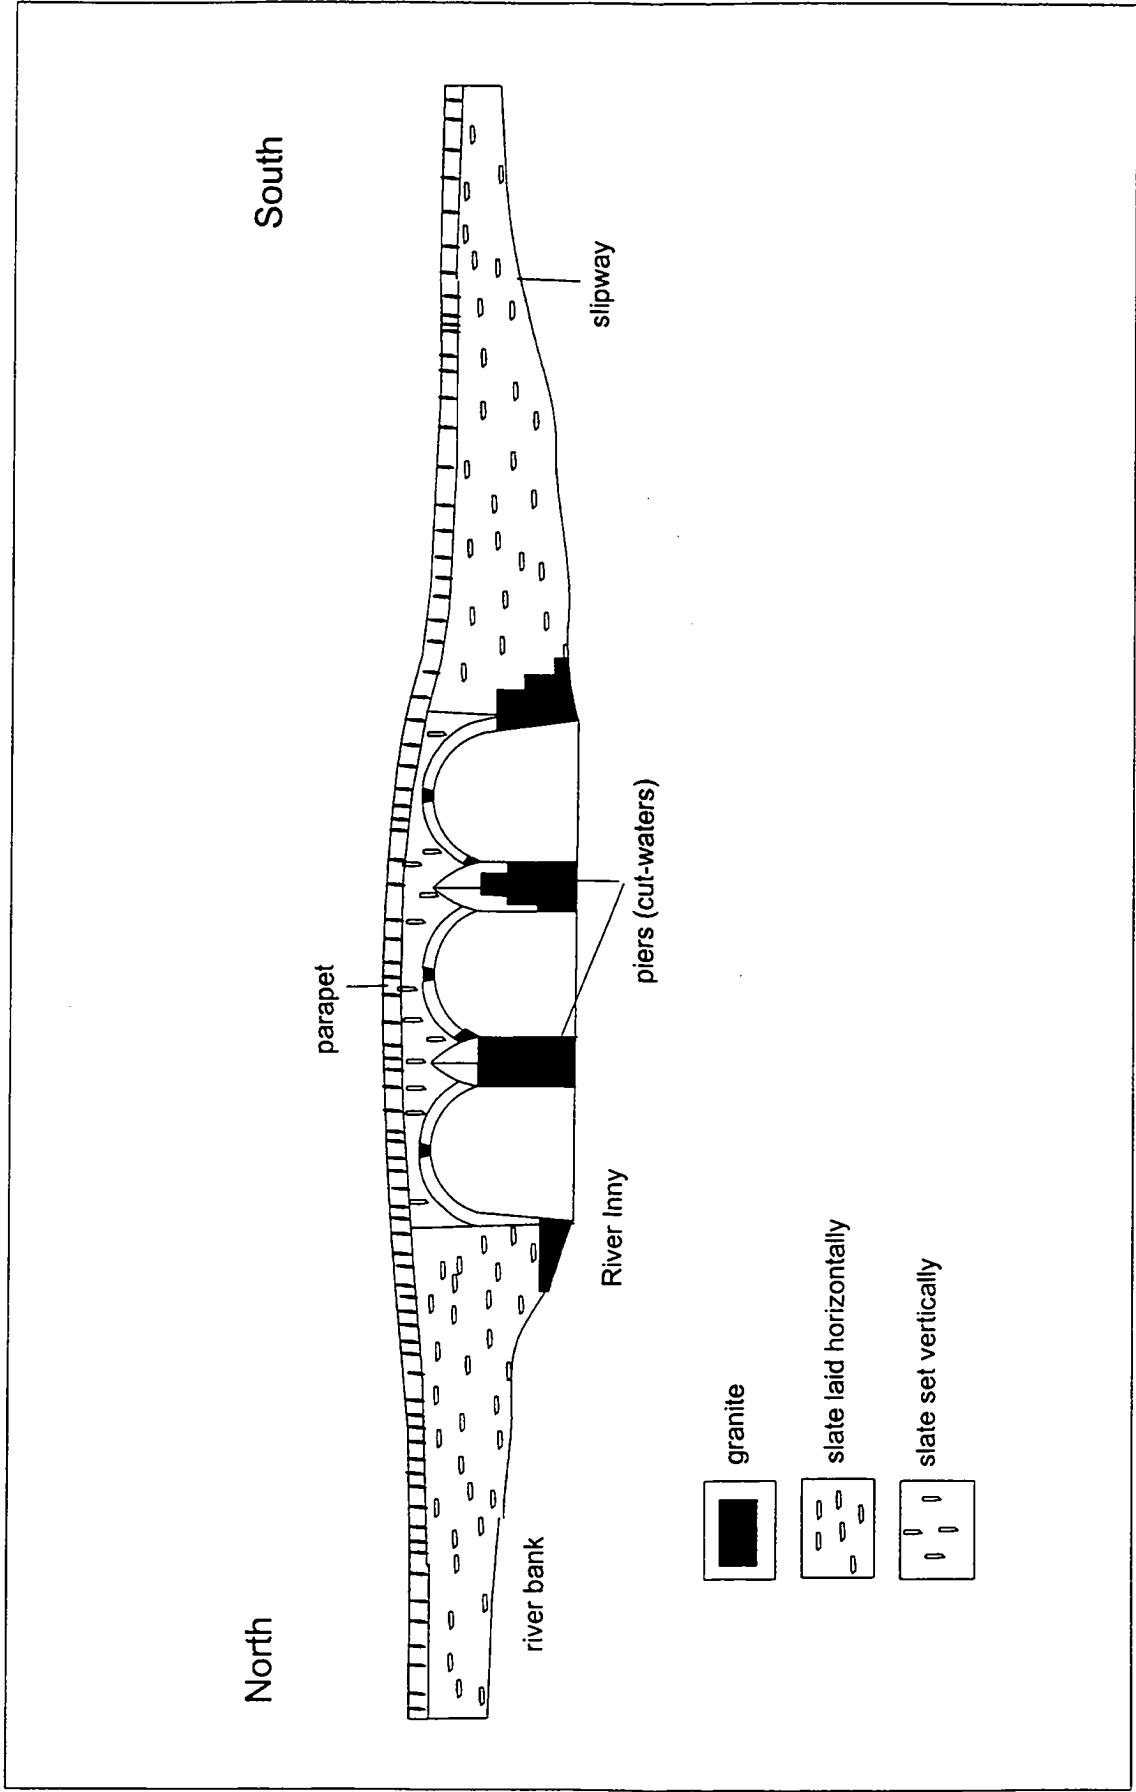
Upstream elevation of Trekenner Bridge, based on sketch (not to scale)
